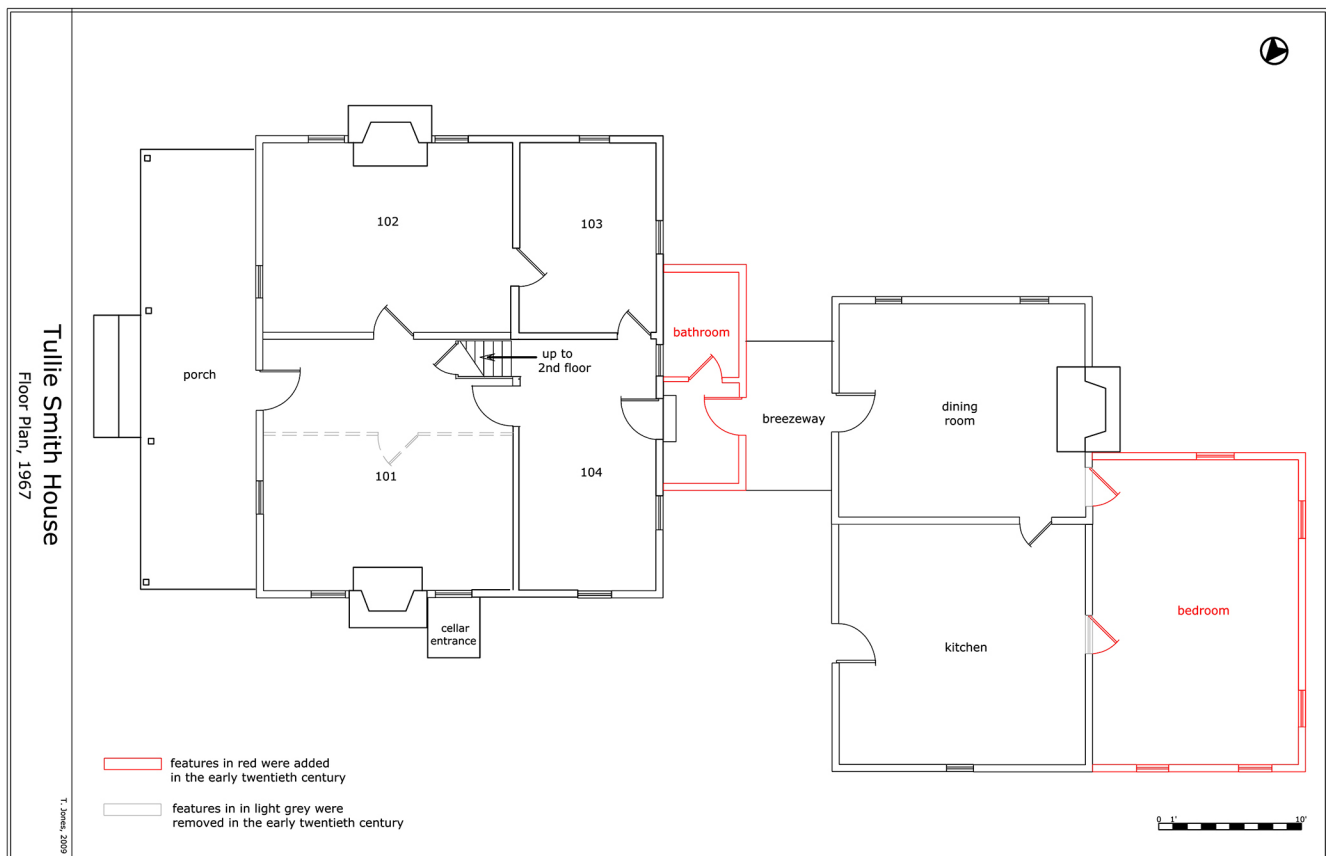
Floor plan as house existed in 1967. (Drawing by T. Jones 2009)
